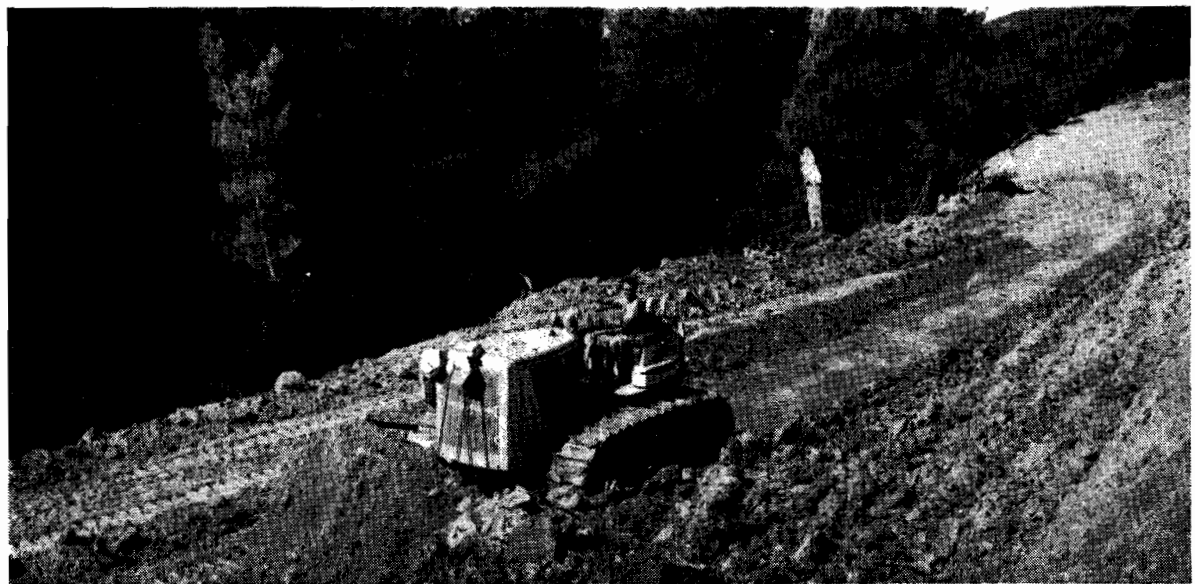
Bulldozer working on reconstruction of Beech Forest-Apollo Bay Road.
